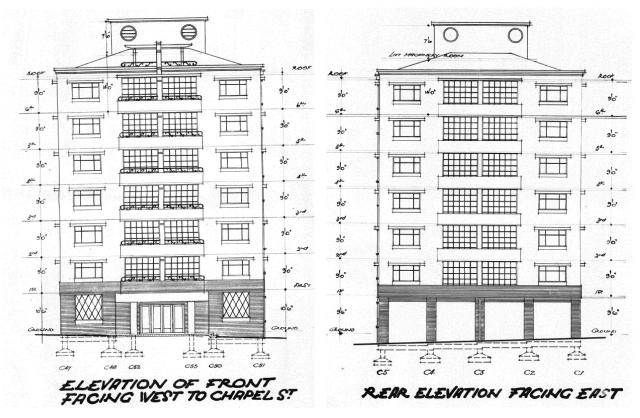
drawings for original 7 storey design – front (west) and rear (east) elevations (Source: BP, sheets 7 +8)
